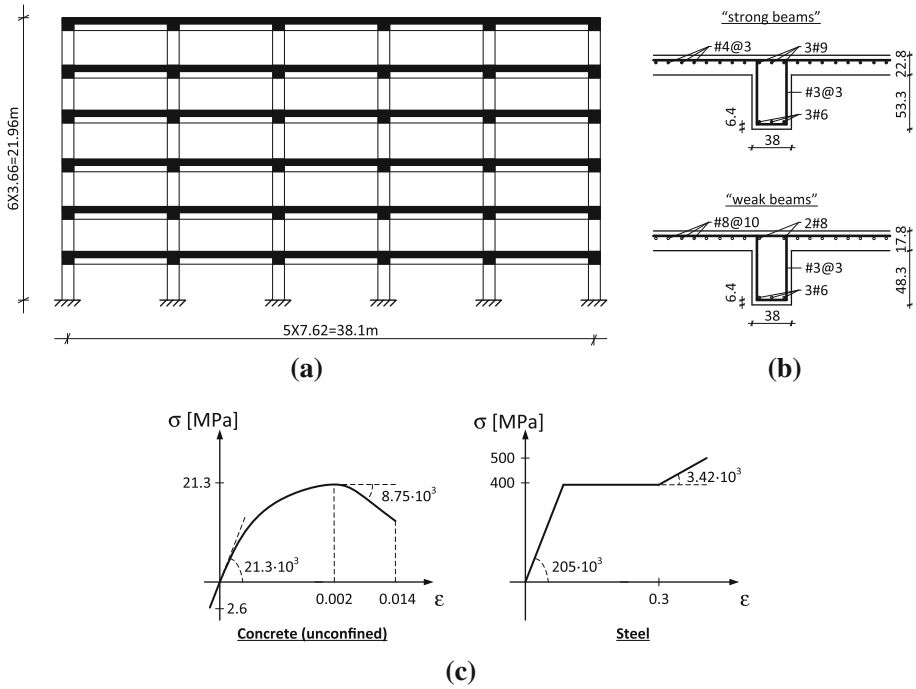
The concrete frame structures adopted from Seidel et al. (1989): a layout b cross section of the beams in the strong beams and weak beams structures, and c stress-strain curves of the unconfined concrete and steel
